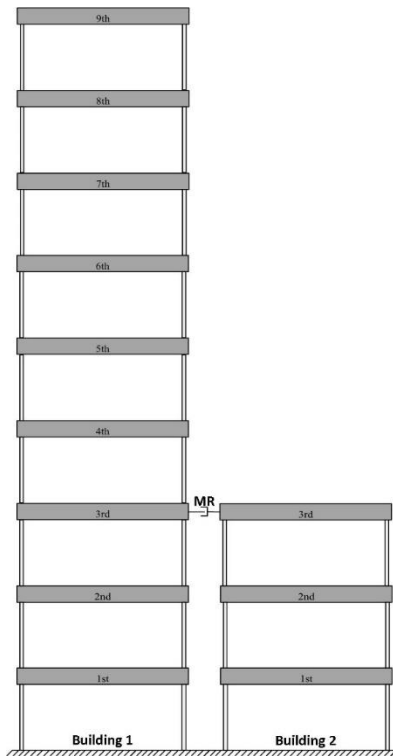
Model of two adjacent buildings [14] connected with MR damper
